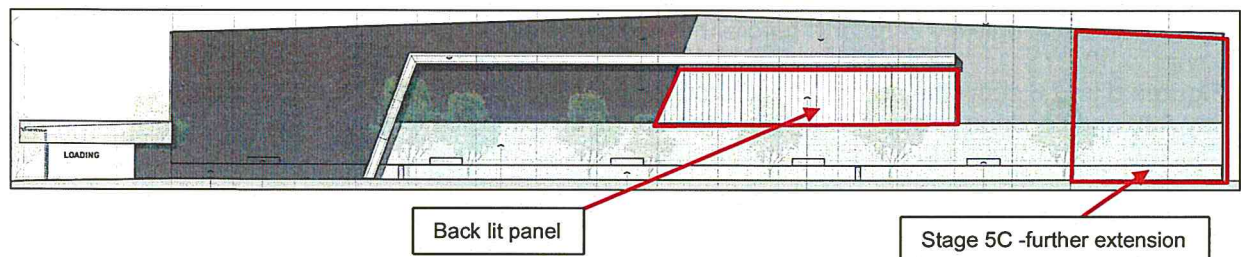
Proposed southern elevation (showing western awning + further high bay extension)
